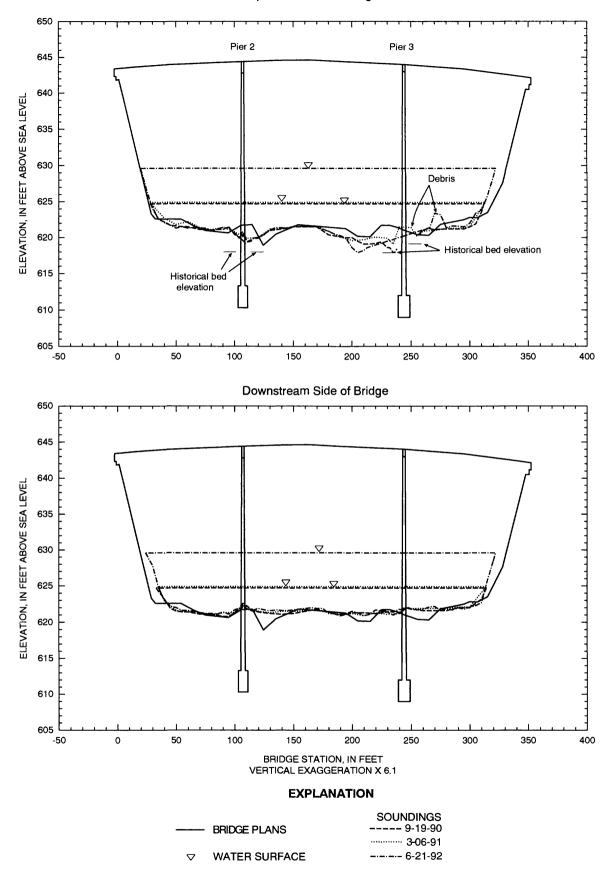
Cross sections showing bed elevations from bridge plans and soundings, State Road 19 over Wabash River at Peru, Indiana.
